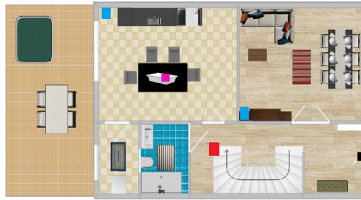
Ground floor plan of the single-family house with the distribution of the devices.
